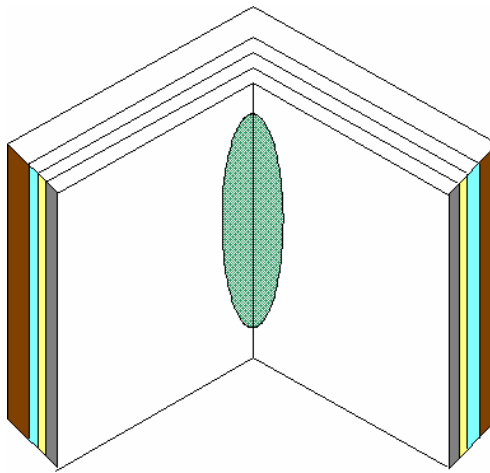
Exterior wall section and the location of concern (i.e., interior surface of the corner in exterior wall)
